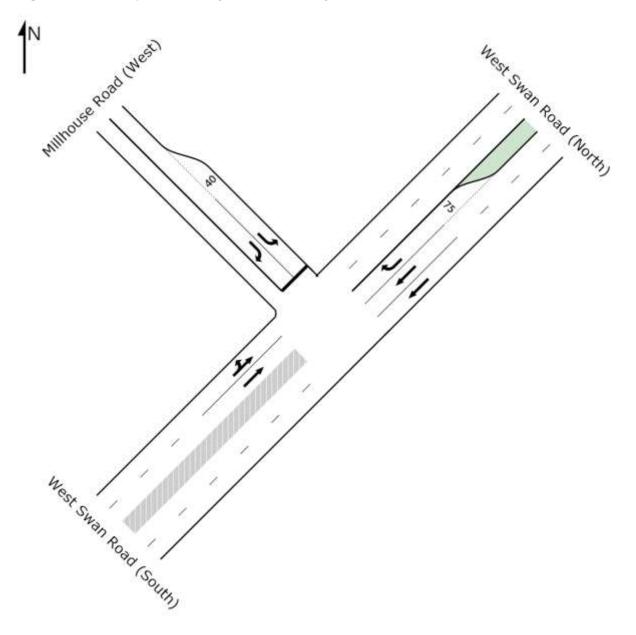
Proposed Priority Intersection Layout of West Swan Road and Millhouse Road
